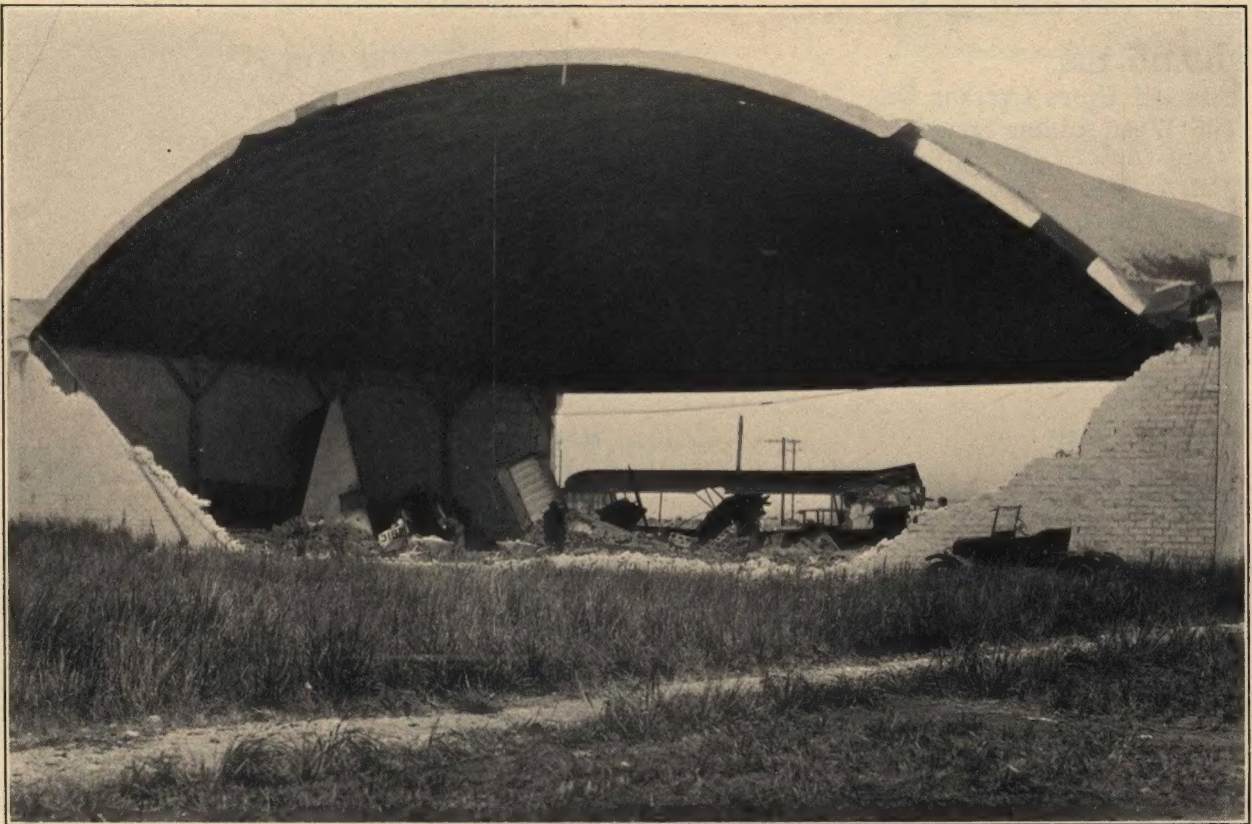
Showing strength of lamella construction—wall failure due to cyclone.
